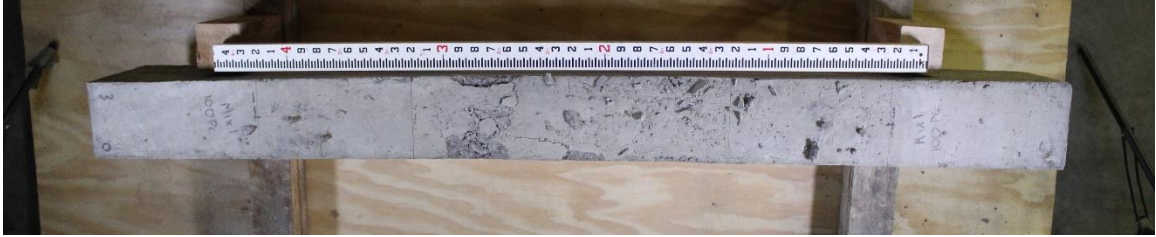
Mixture 1 (100PC) beam #30: concrete beam top view.
